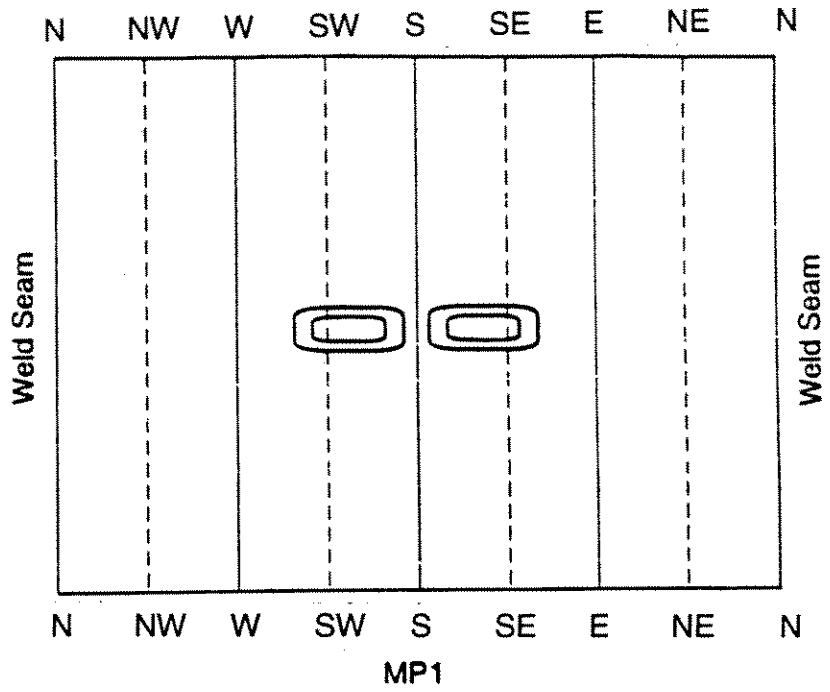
Unfolded View of Patch Layout for Test Specimens MP1 and MP2
